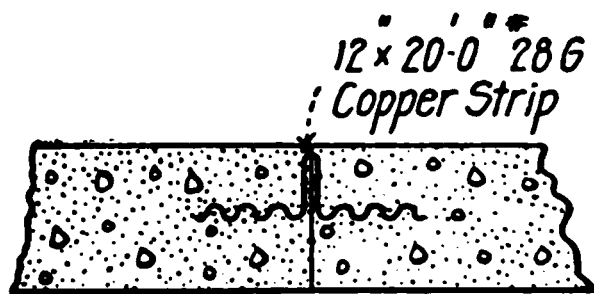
Sketch showing method of making copper joints between sections of concrete.
